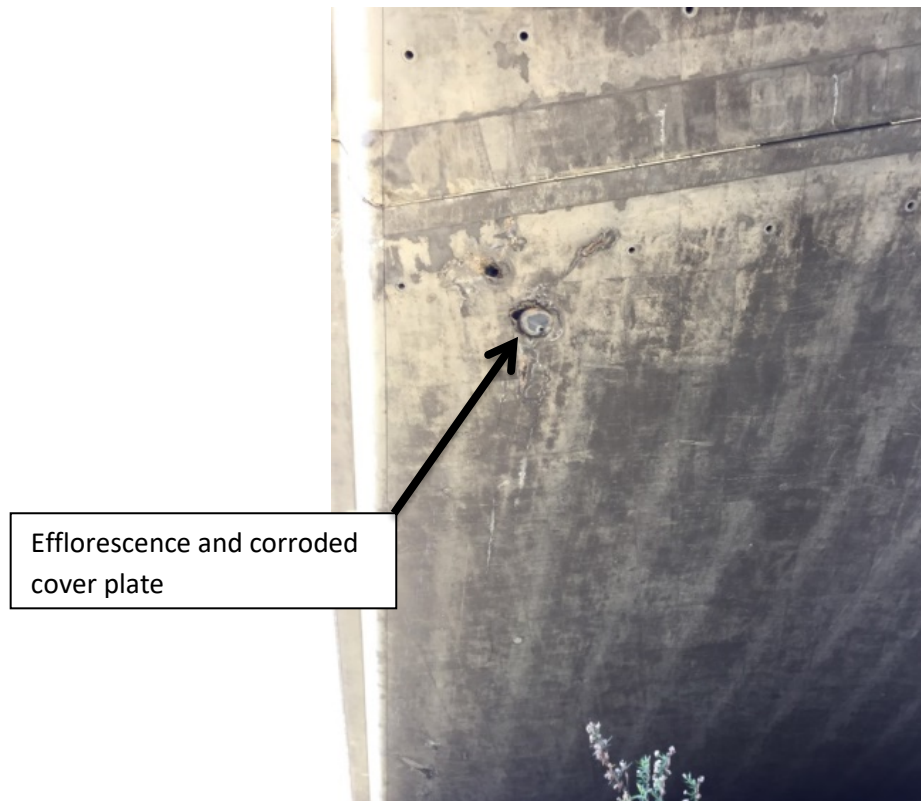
Bridge Soffit showing efflorescence and corroded cover plate
